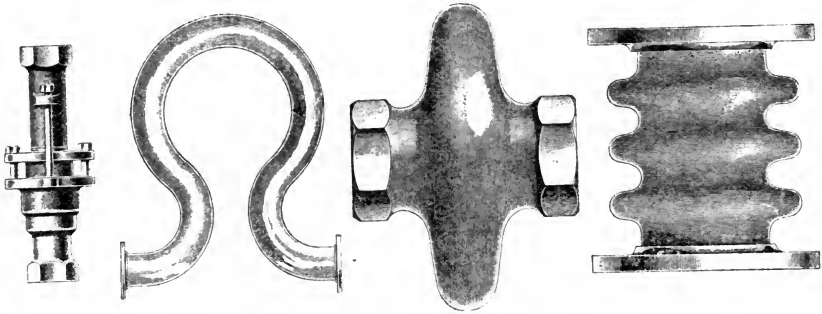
Expansion joints for long straight runs of rigidly jointed pipes.
